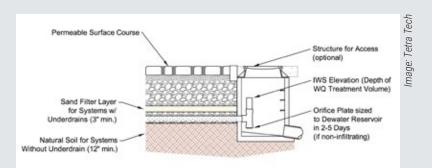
Permeable interlocking concrete pavement cross-section.
